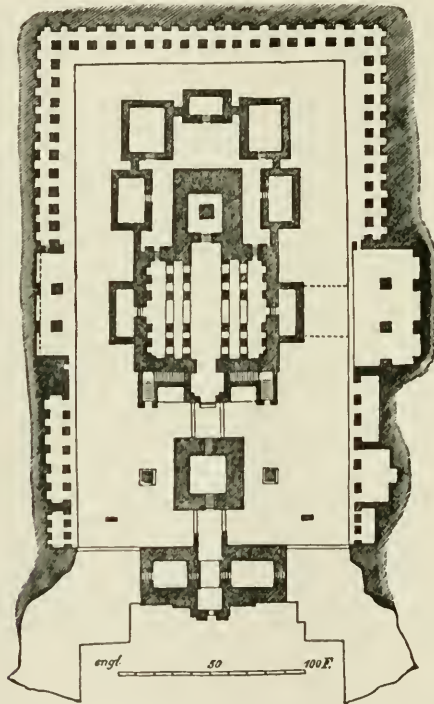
Ground Plan of the Kailasa Cave of Ellora.
